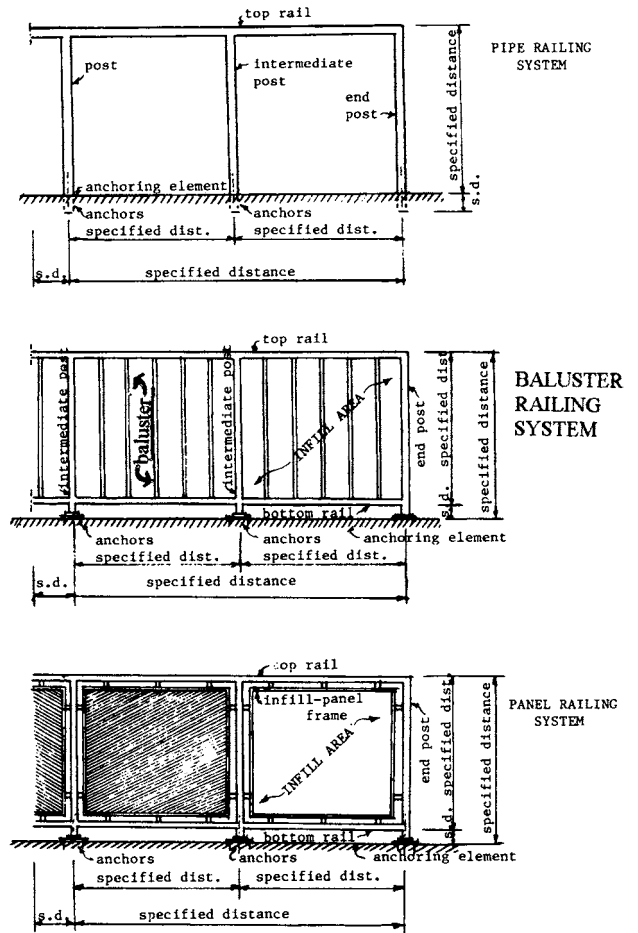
Front Views of Sections of Three Typical Railing Systems
